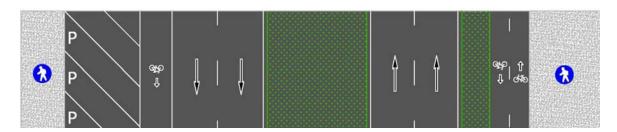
K: Old Colony Avenue Alternative C.2 Cross Section with Separated Cycle Track
